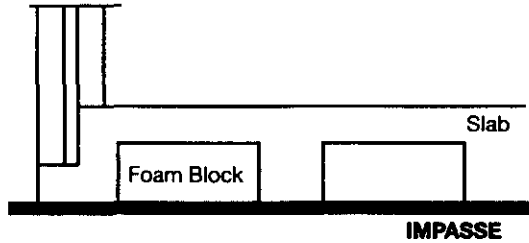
Shows Impasse Barrier installed beneath a waffle raft.
